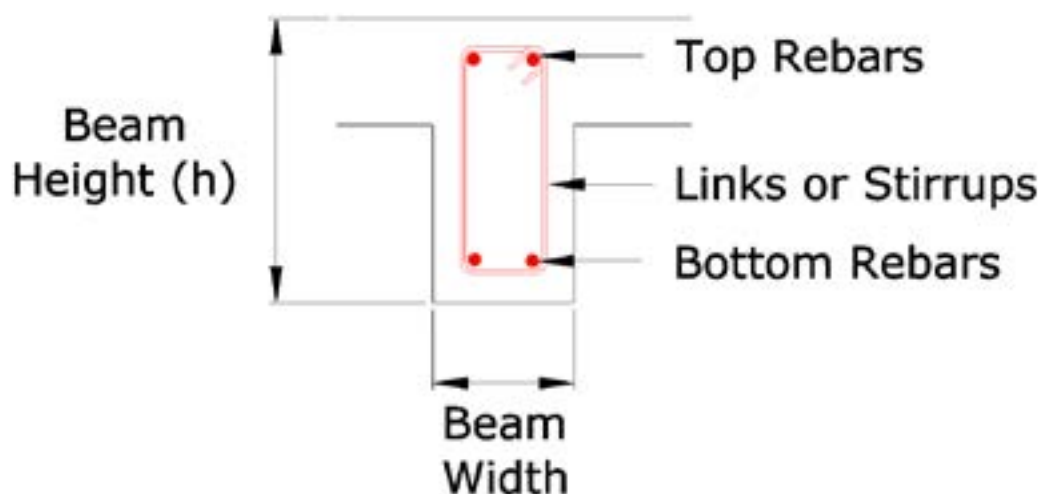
REINFORCED CONCRETE SUSPENDED BEAM
